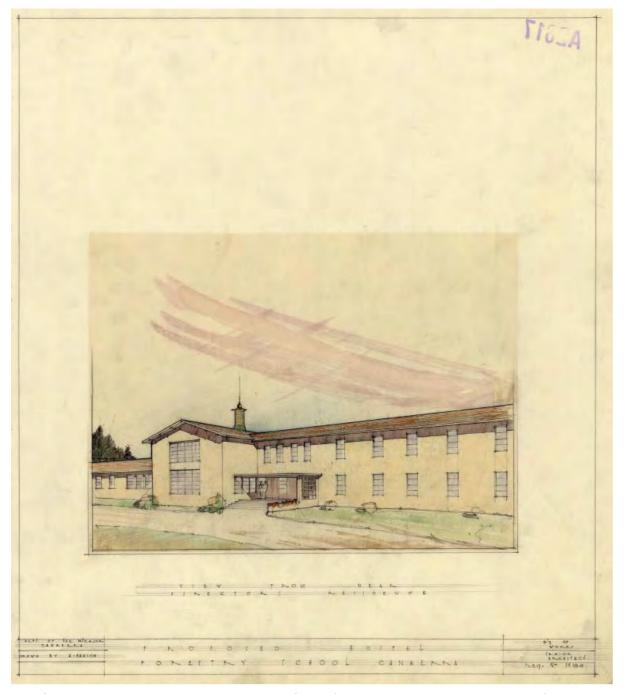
Proposed east elevation of the new hostel A. Hanson for the Department of Interior (NAA 7689908)
